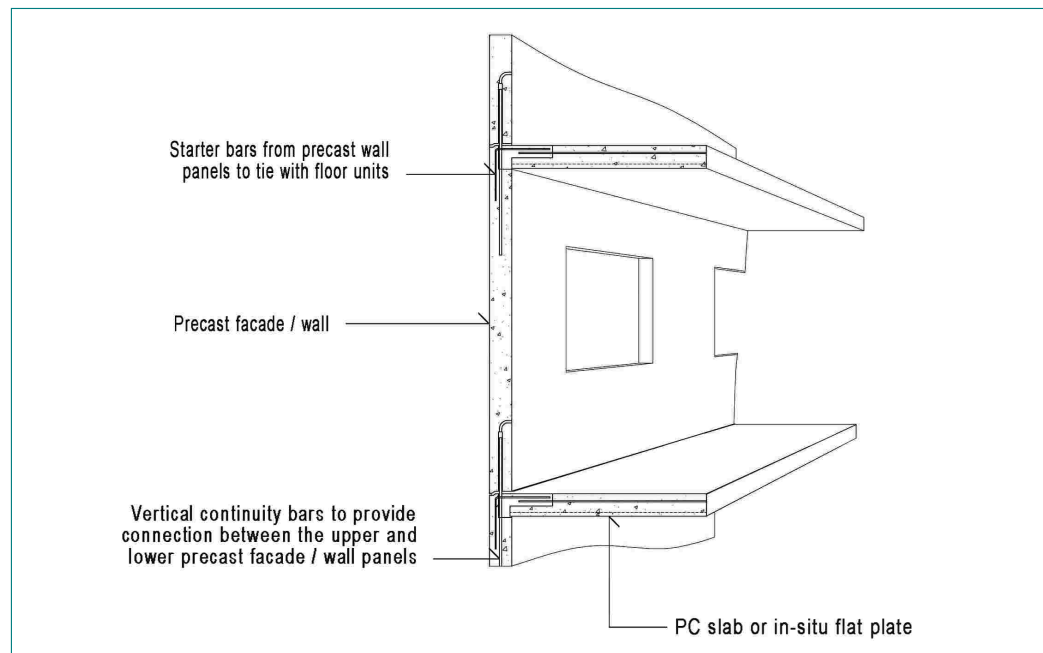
Design principle for connection between precast façade wall with floor slab
